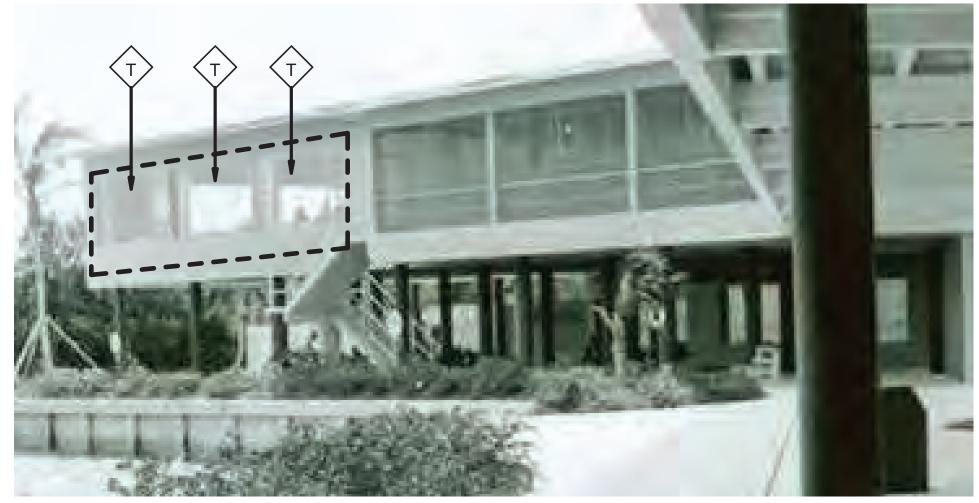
EAST ELEVATION OF VISITOR CENTER (1959)
